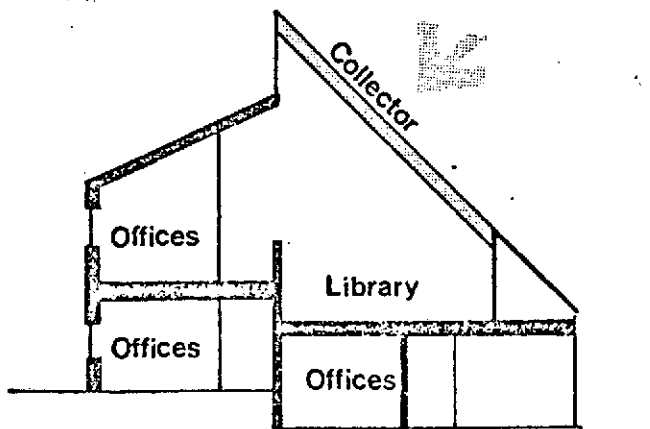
Plan and Elevation Sketches of Proposed Solar Building. ³⁹ - 38-
